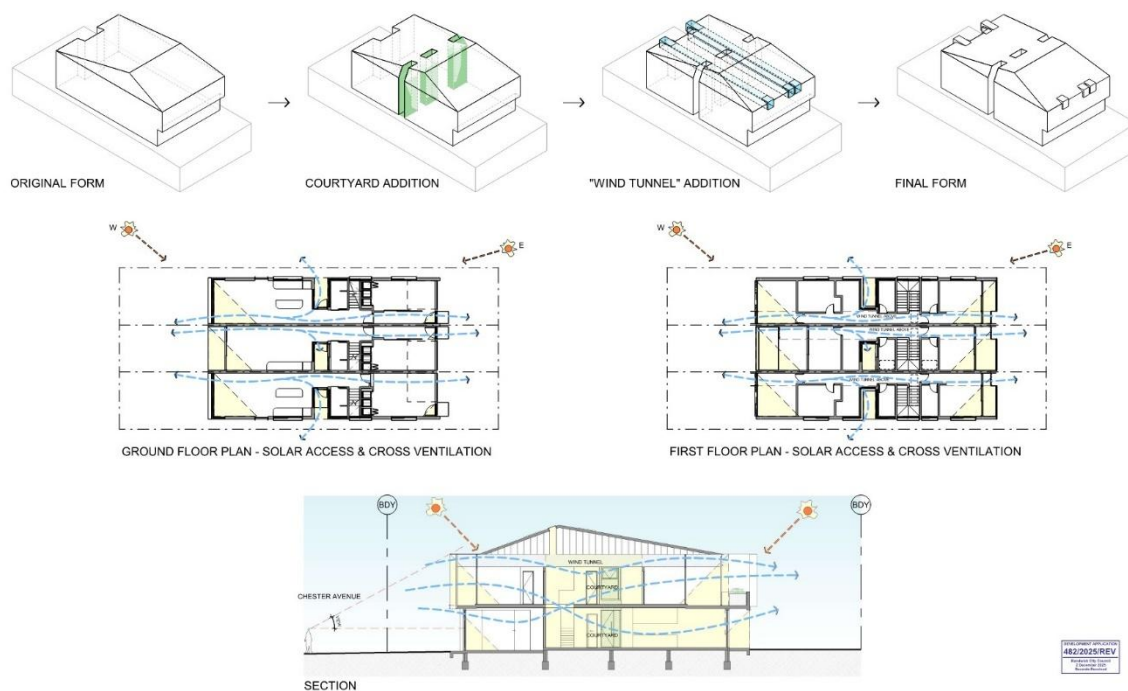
Ventilation diagram (Source: Bryan Long Group)
